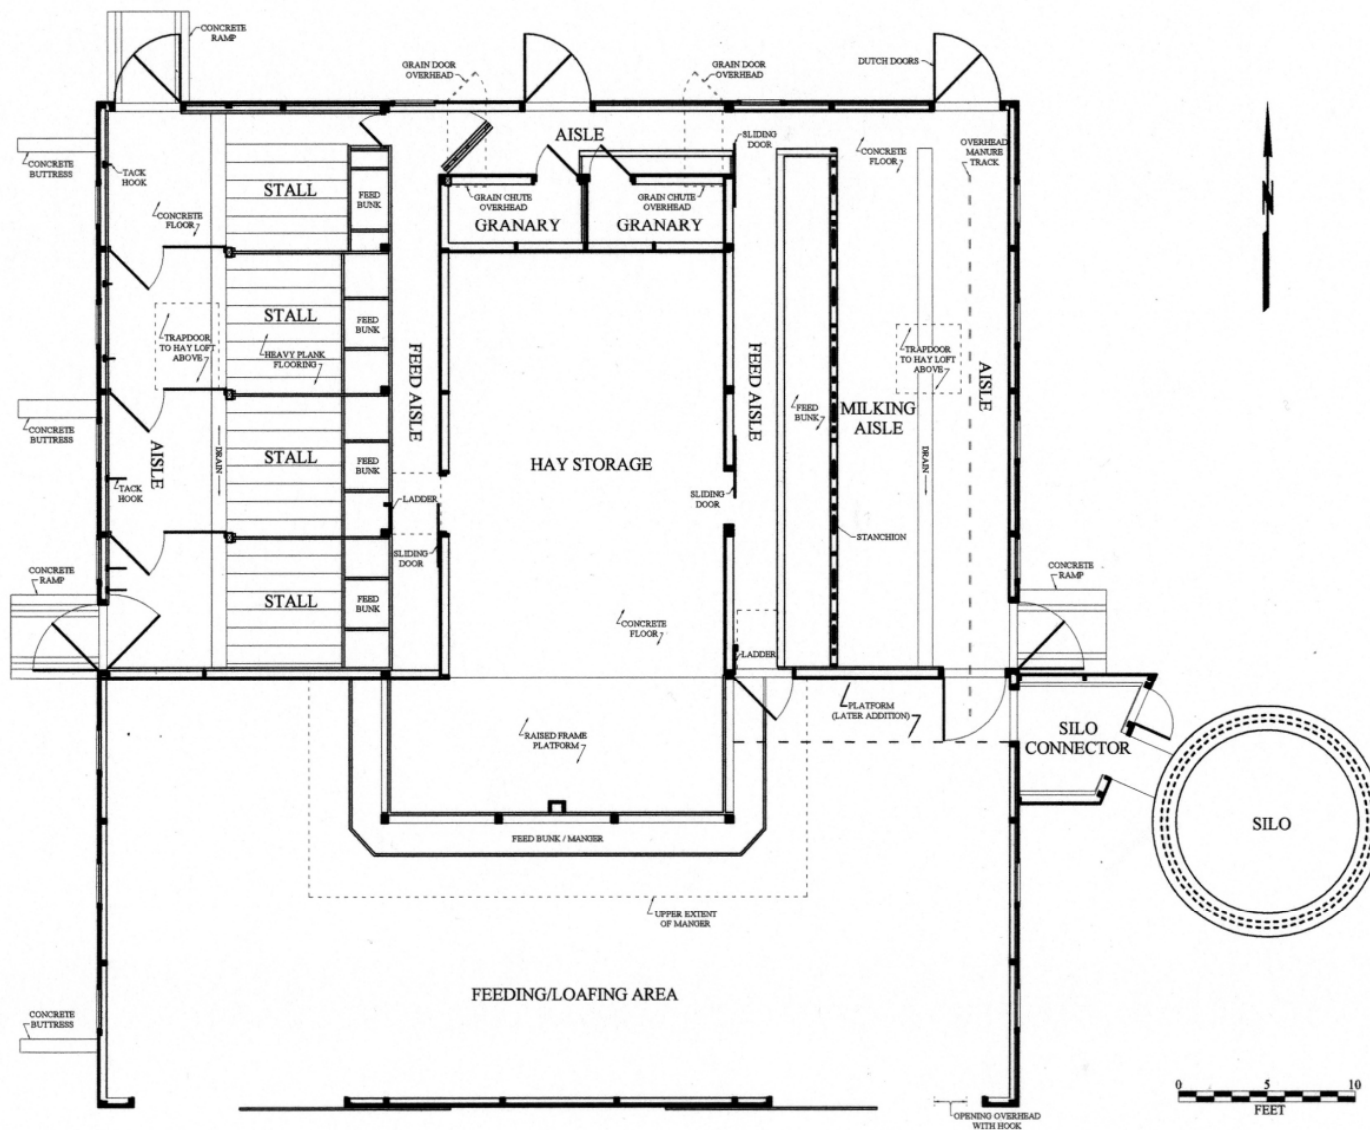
Ground floor plan of the barn at the Sibley Tenant Farmstead.
